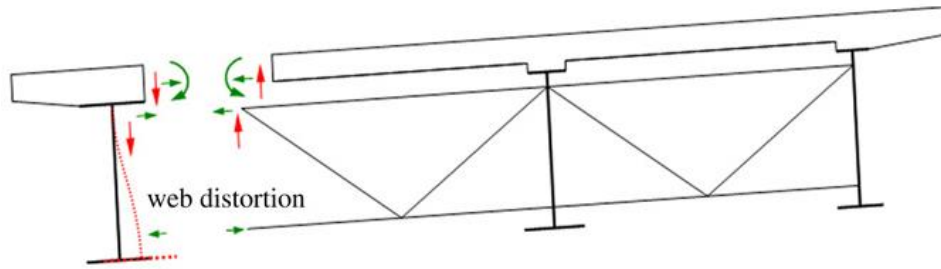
Internal Forces in Composite I-Girder Bridge
